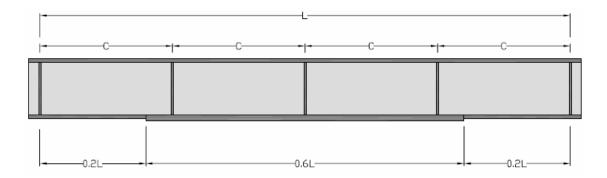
Typical Elevation of Steel Plate Girder Sections
